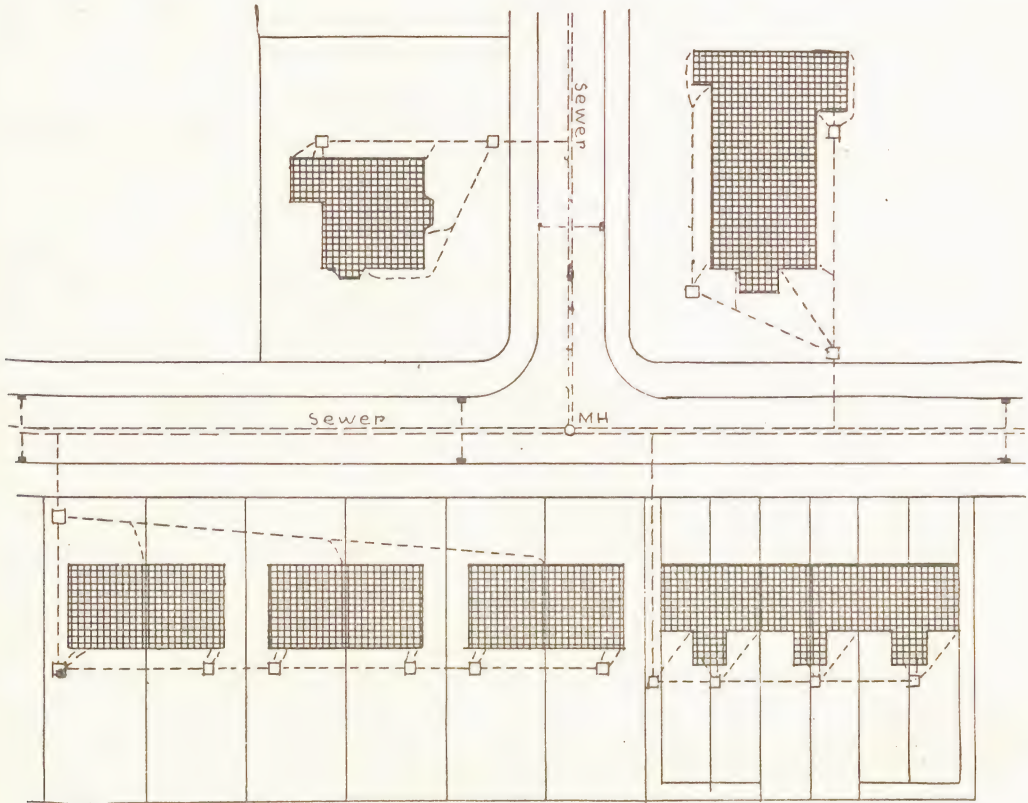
Part of town drainage plan, showing sewers and connections from private drains.
